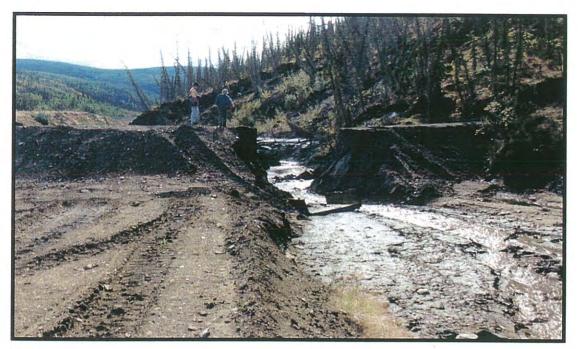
Looking upstream to the failed settling pond outlet.
